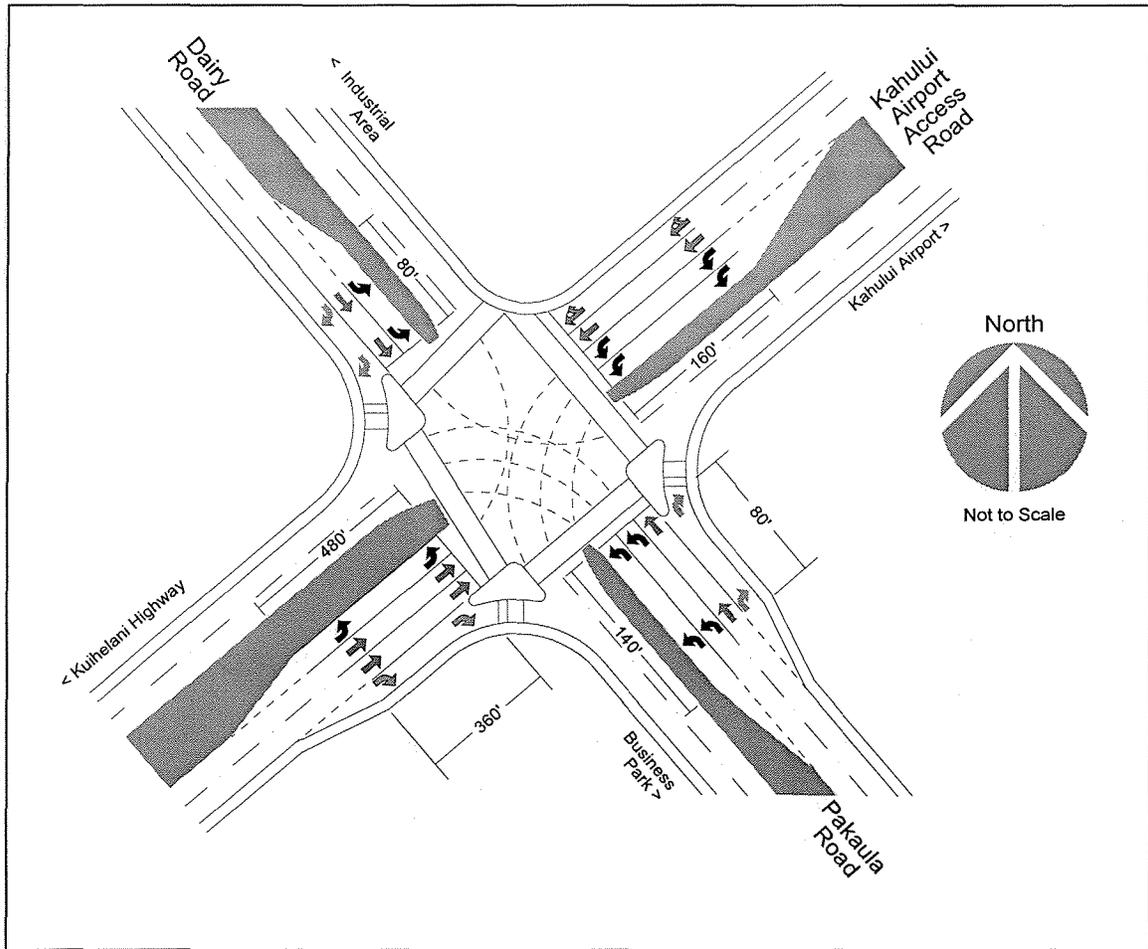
Intersection with Dairy Road and Pakaula Road
